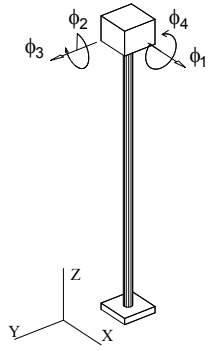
A simplified 4 DOF model of a bridge pier test structure
